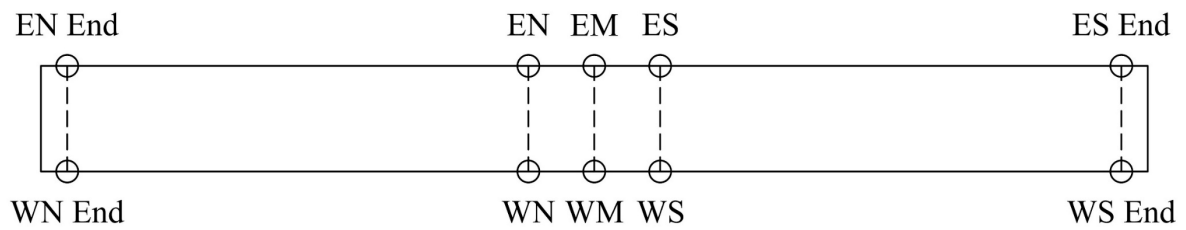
Instrumented potentiometer sections for Essex Bridge beams
